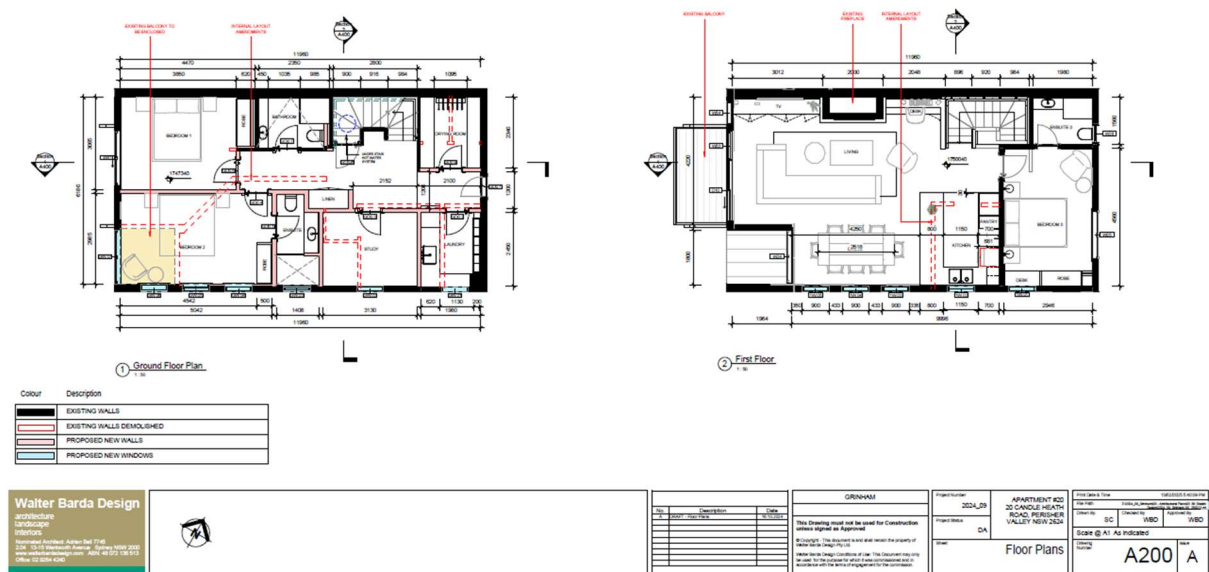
Extract of the Floor Plans demonstrating the proposed development
